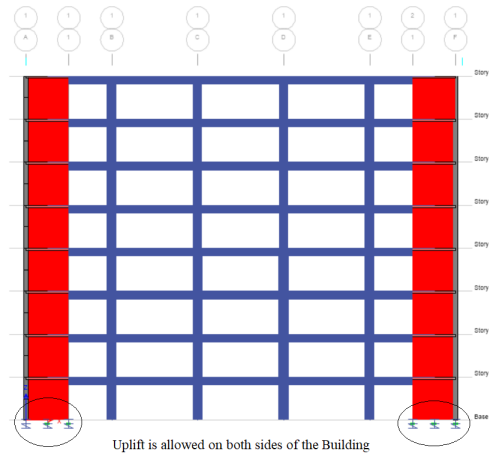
Elevation View of the Uplift Allowed 8 story Building
